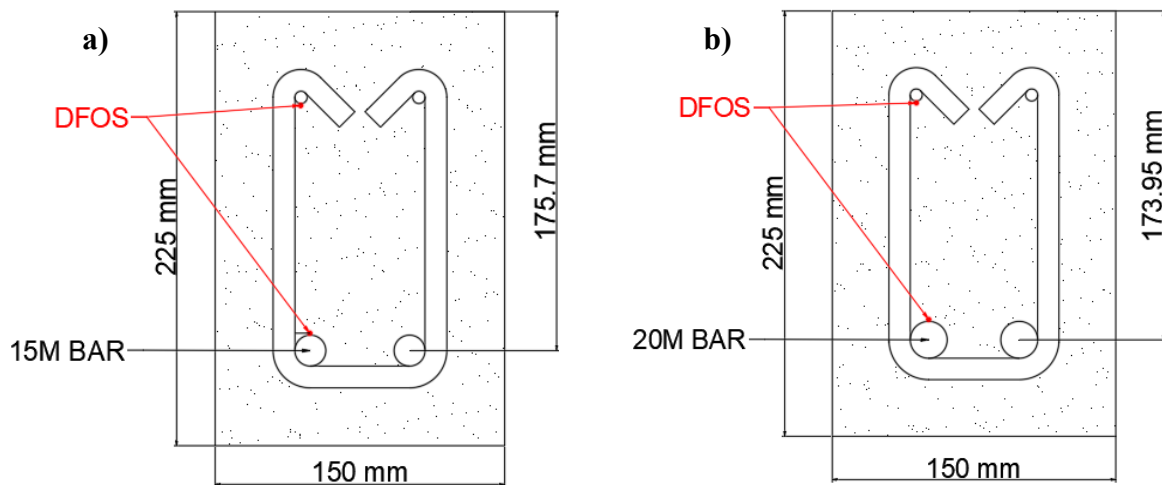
Beam Specimen Cross-Sections a) 1.5% Reinforcement Ratio and b) 2.3% Reinforcement Ratio
